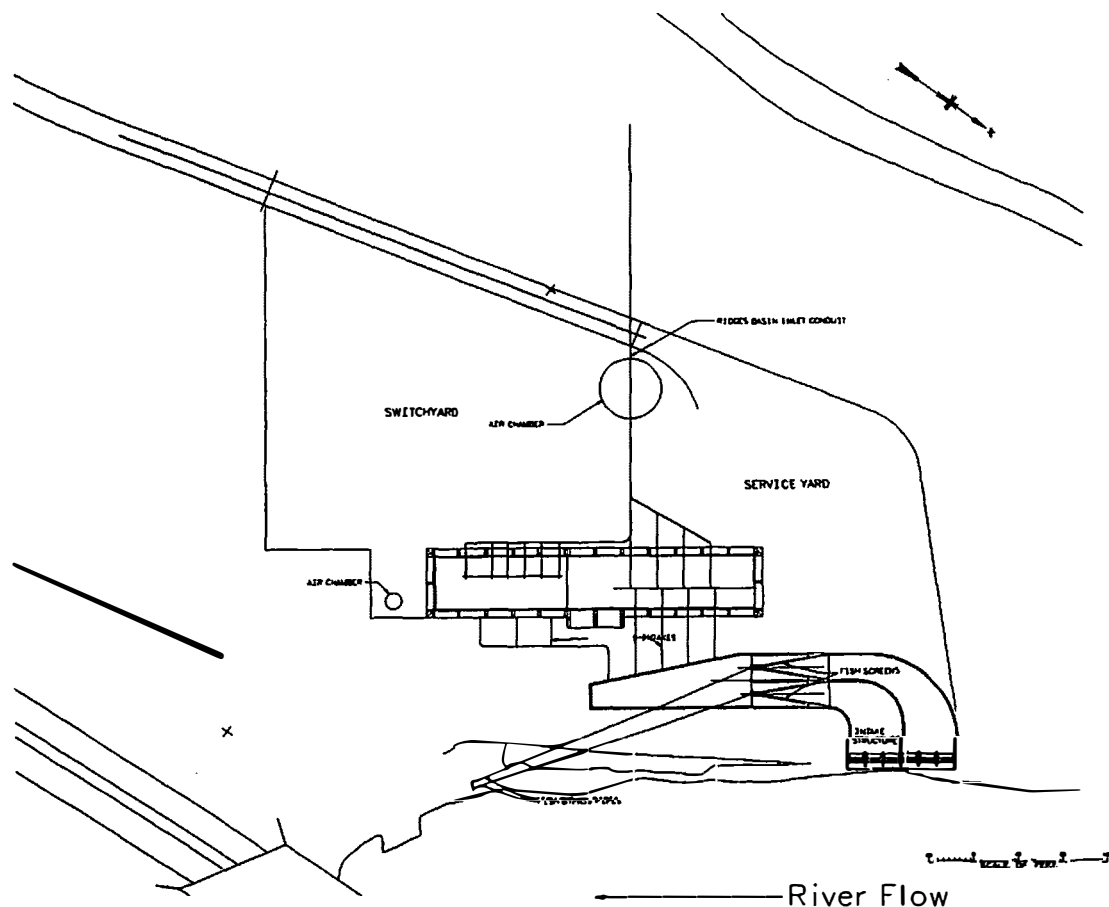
Plan view of the Durango Pumping Plant site, showing the proposed layout of the intake structure, fish screening facilities, sump, and pumping plant structure.
